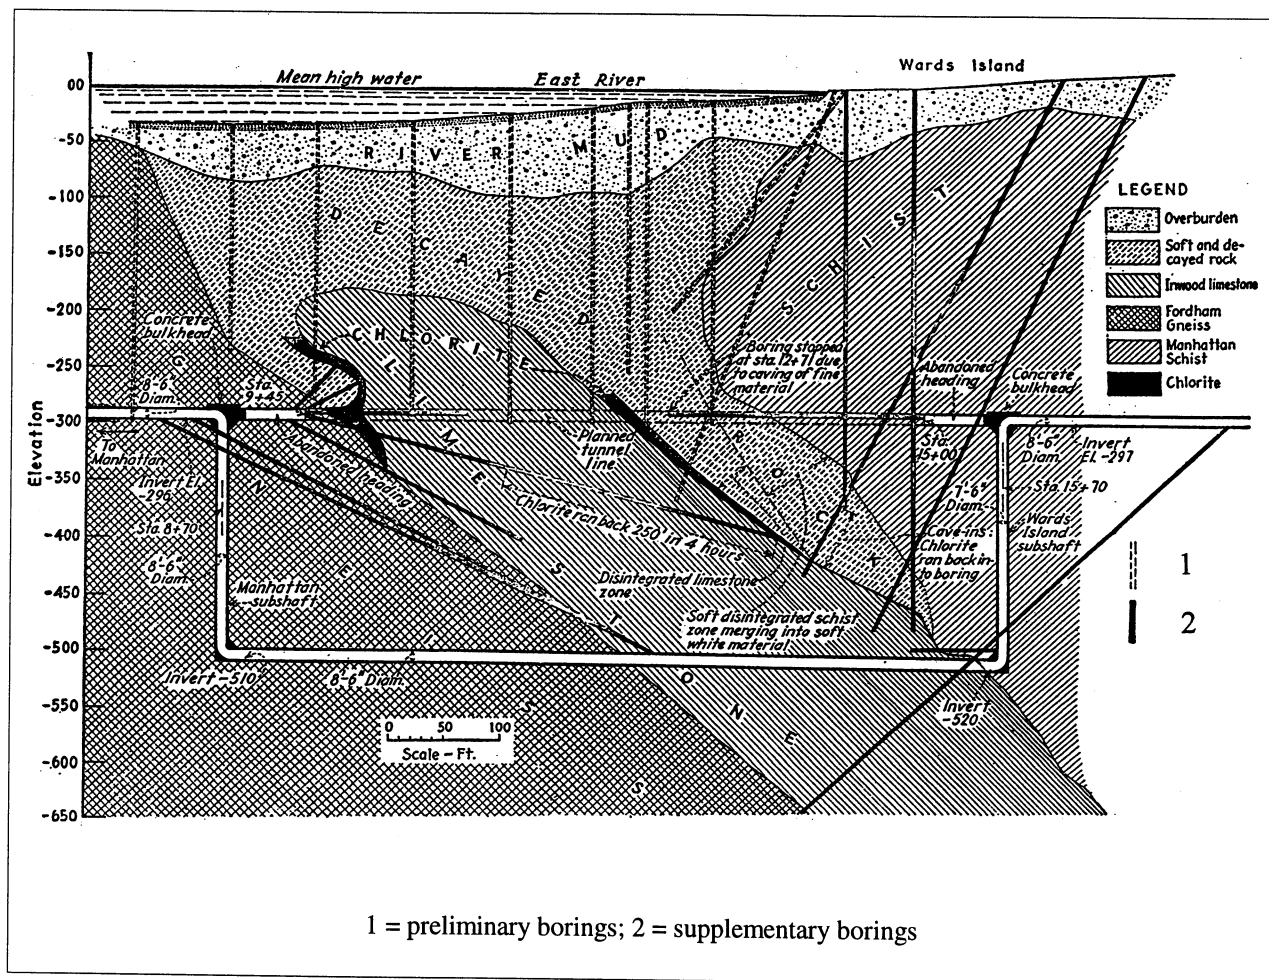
Wars Island Sewer Tunnel - Longitudinal section
